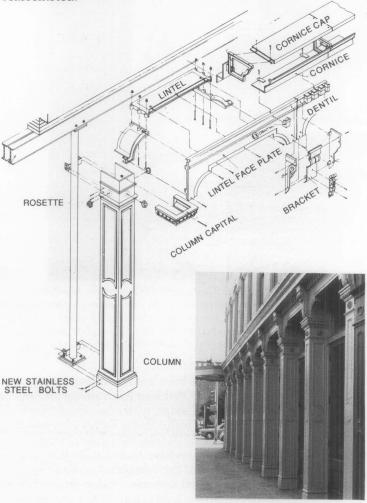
Architectural cast iron is made of many small components bolted and screwed together. (a) This exploded view of a storefront illustrates the variety of elements, including brackets, fasteners, and holes for bolts. (b) The storefront was replicated in cast iron because of the extensive damage and structural failure, a detail of which is shown in Fig. 11. Drawing and photo: Historical Arts & Casting, Inc.
